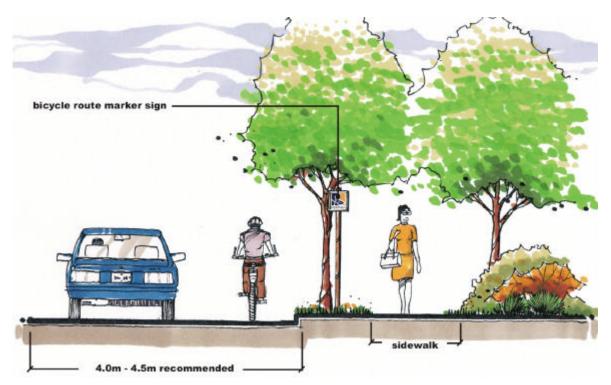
On-Street Signed Route, Typical Cross Section
